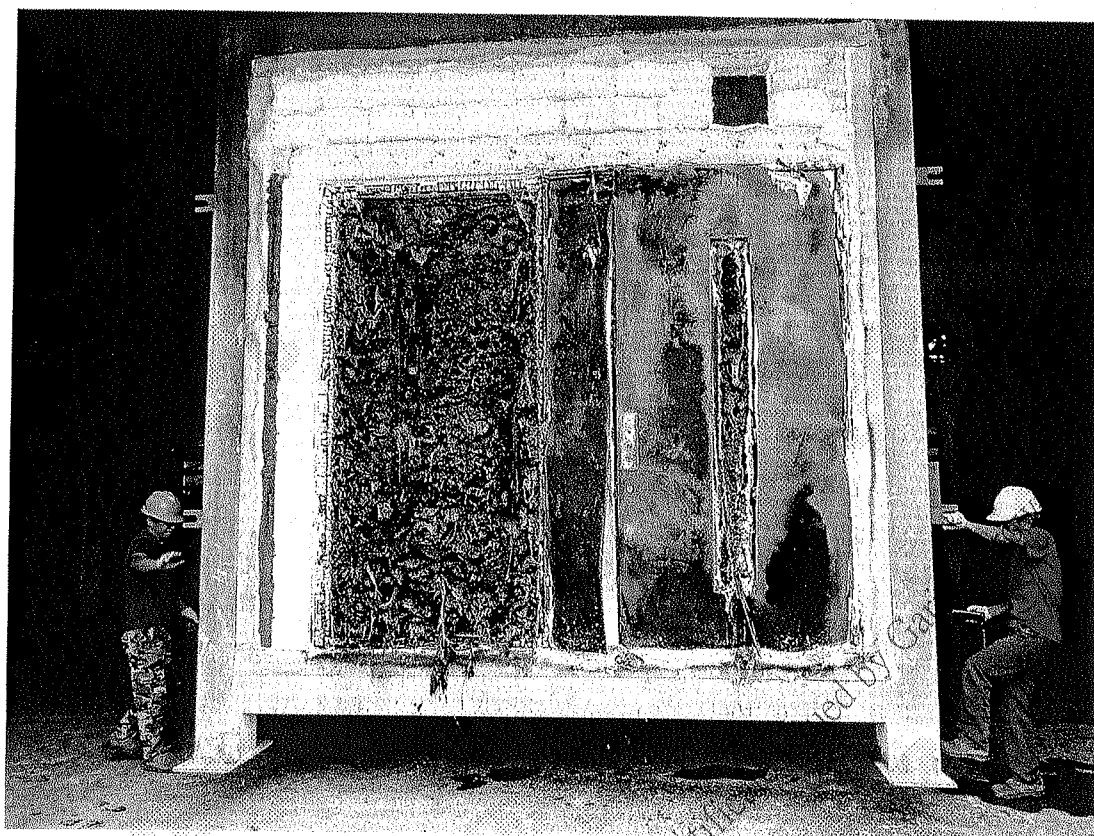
Unexposed surface of the specimen at 60 minute of test.
